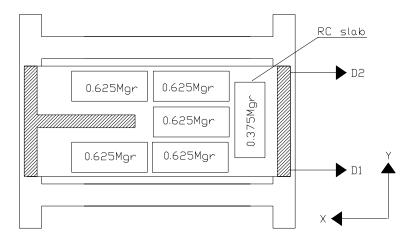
Instrumentation set-up: 1st Level - Plan view.
